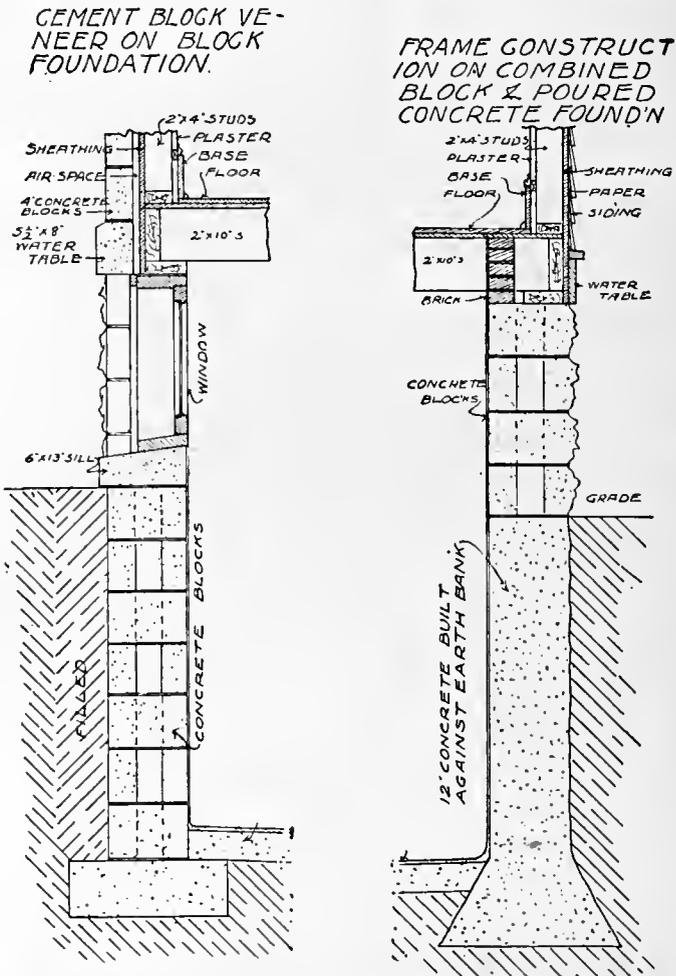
Two Standard Types of Concrete Foundations for Houses.
